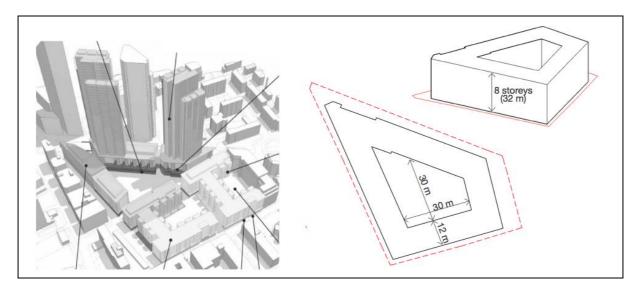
(left) Foster and Partners' proposal for 250 City Road, London, and (right) an alternative arrangement of the same floor area on the same site.
